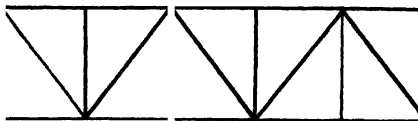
Single-Intersection Triangular Truss with Verticals.
